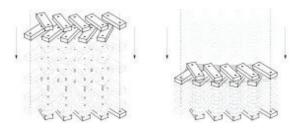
"Wood brick" layers are joined into a block and then stacked. Altering in orientation, they create varied transparency.
